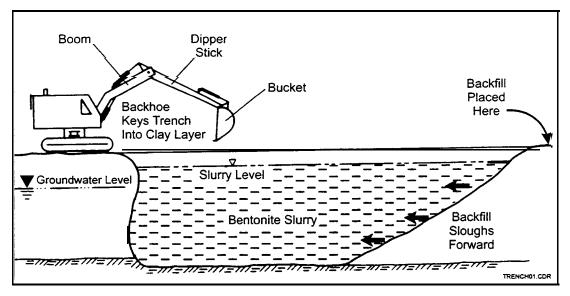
Conventional Backhoe Excavation of a Slurry Cutoff Wall (after Ryan, 1985)
